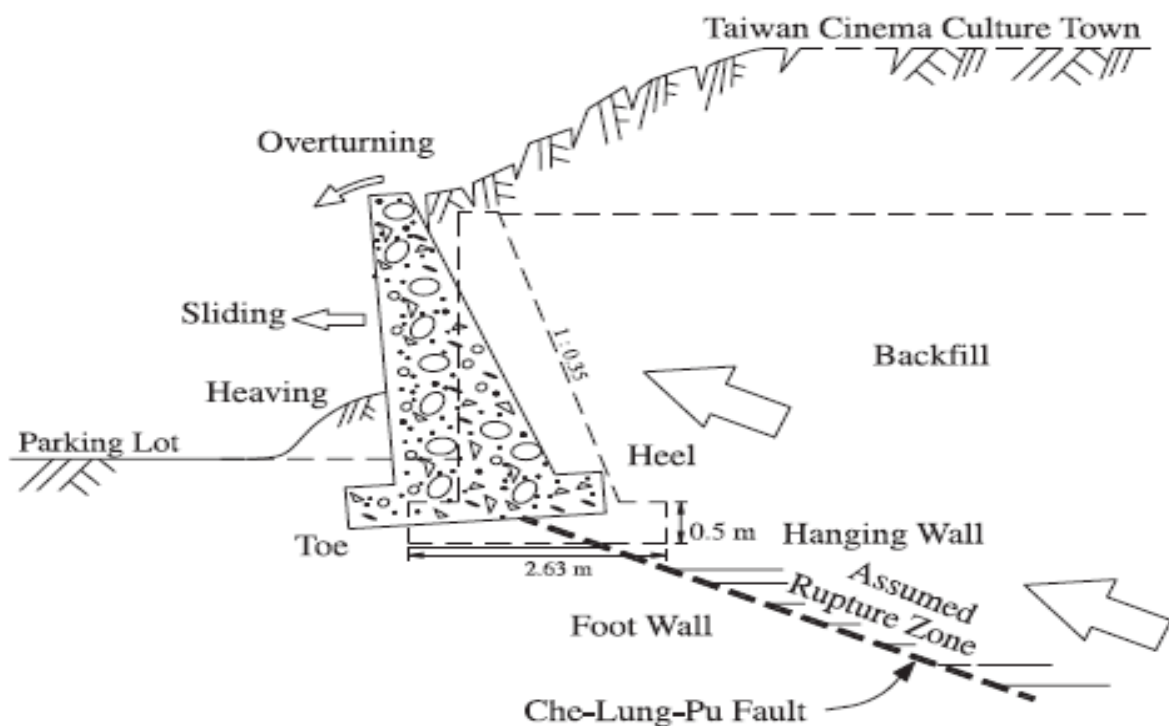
Schematic diagram of the wall damaged by fault rupture [21].
